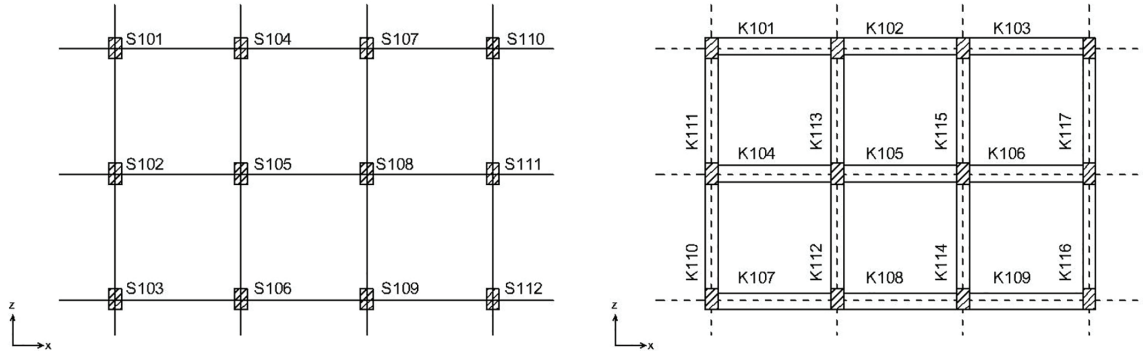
Column and beam layout plan of the 2-storey 3-span structure
